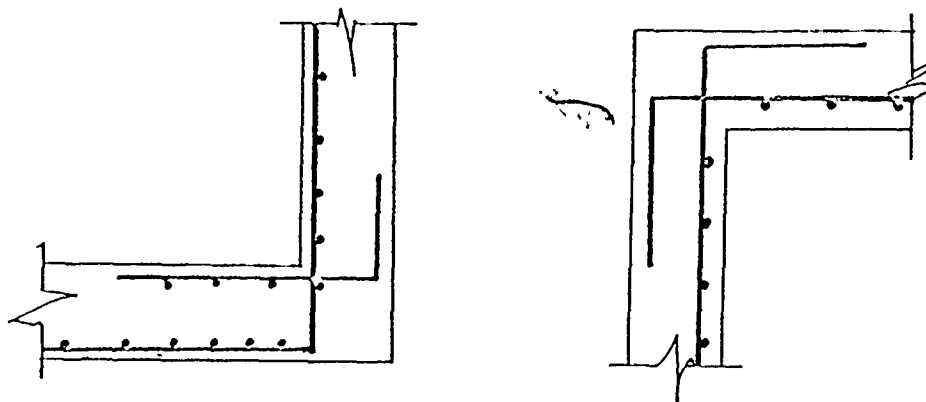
DETAIL PROPOSED BY BOUGHTON (52)
